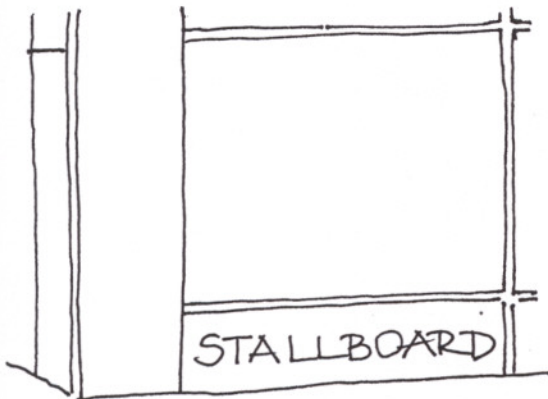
Stallboard Sign (Source: <http://palm.act.gov.au/tplan/web>)
